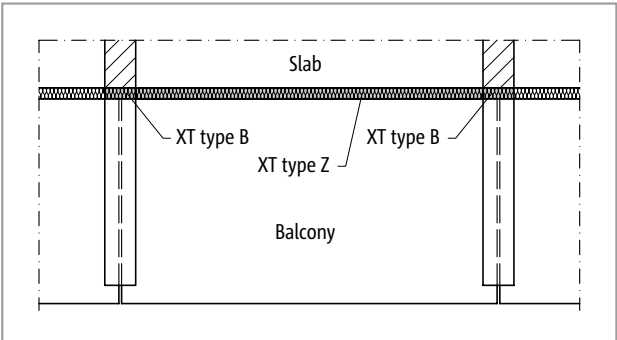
Schöck Isokorb® XT type B: Balcony construction with freely cantilevered downstand beams (prefabricated balcony)
